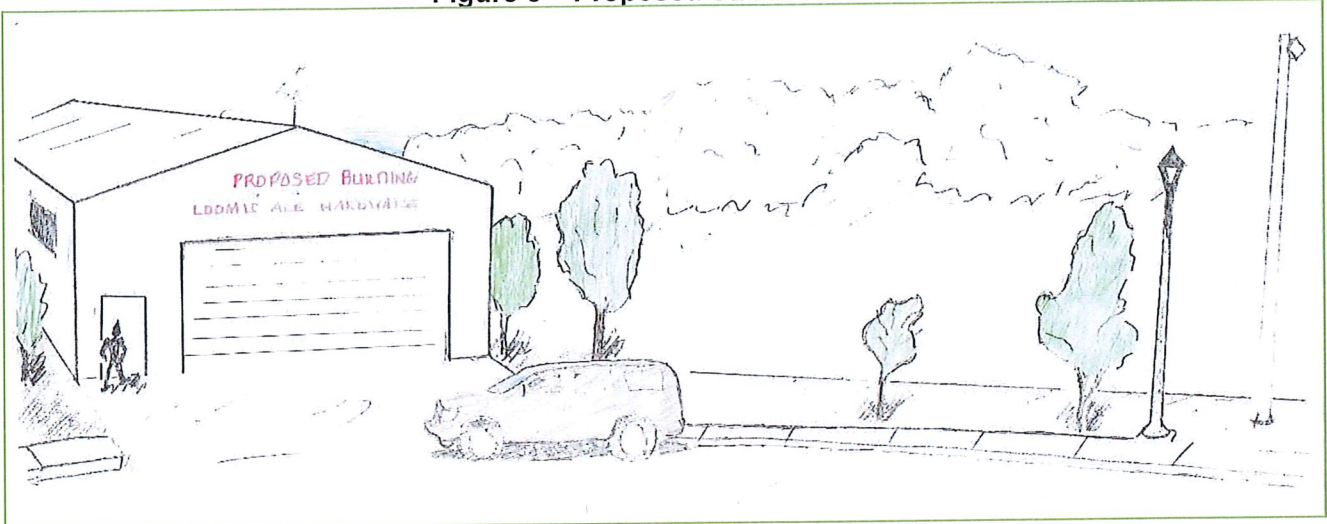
provides examples of the proposed structure. Note man door on front, fixed windows on the sides.
